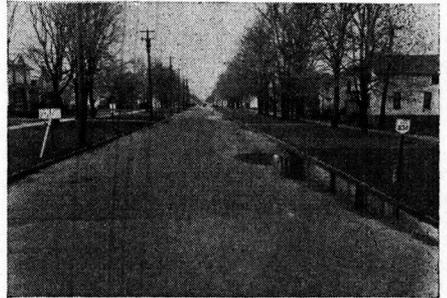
Many sections of streets on the highway system have become distorted and retard drainage. (Before)
